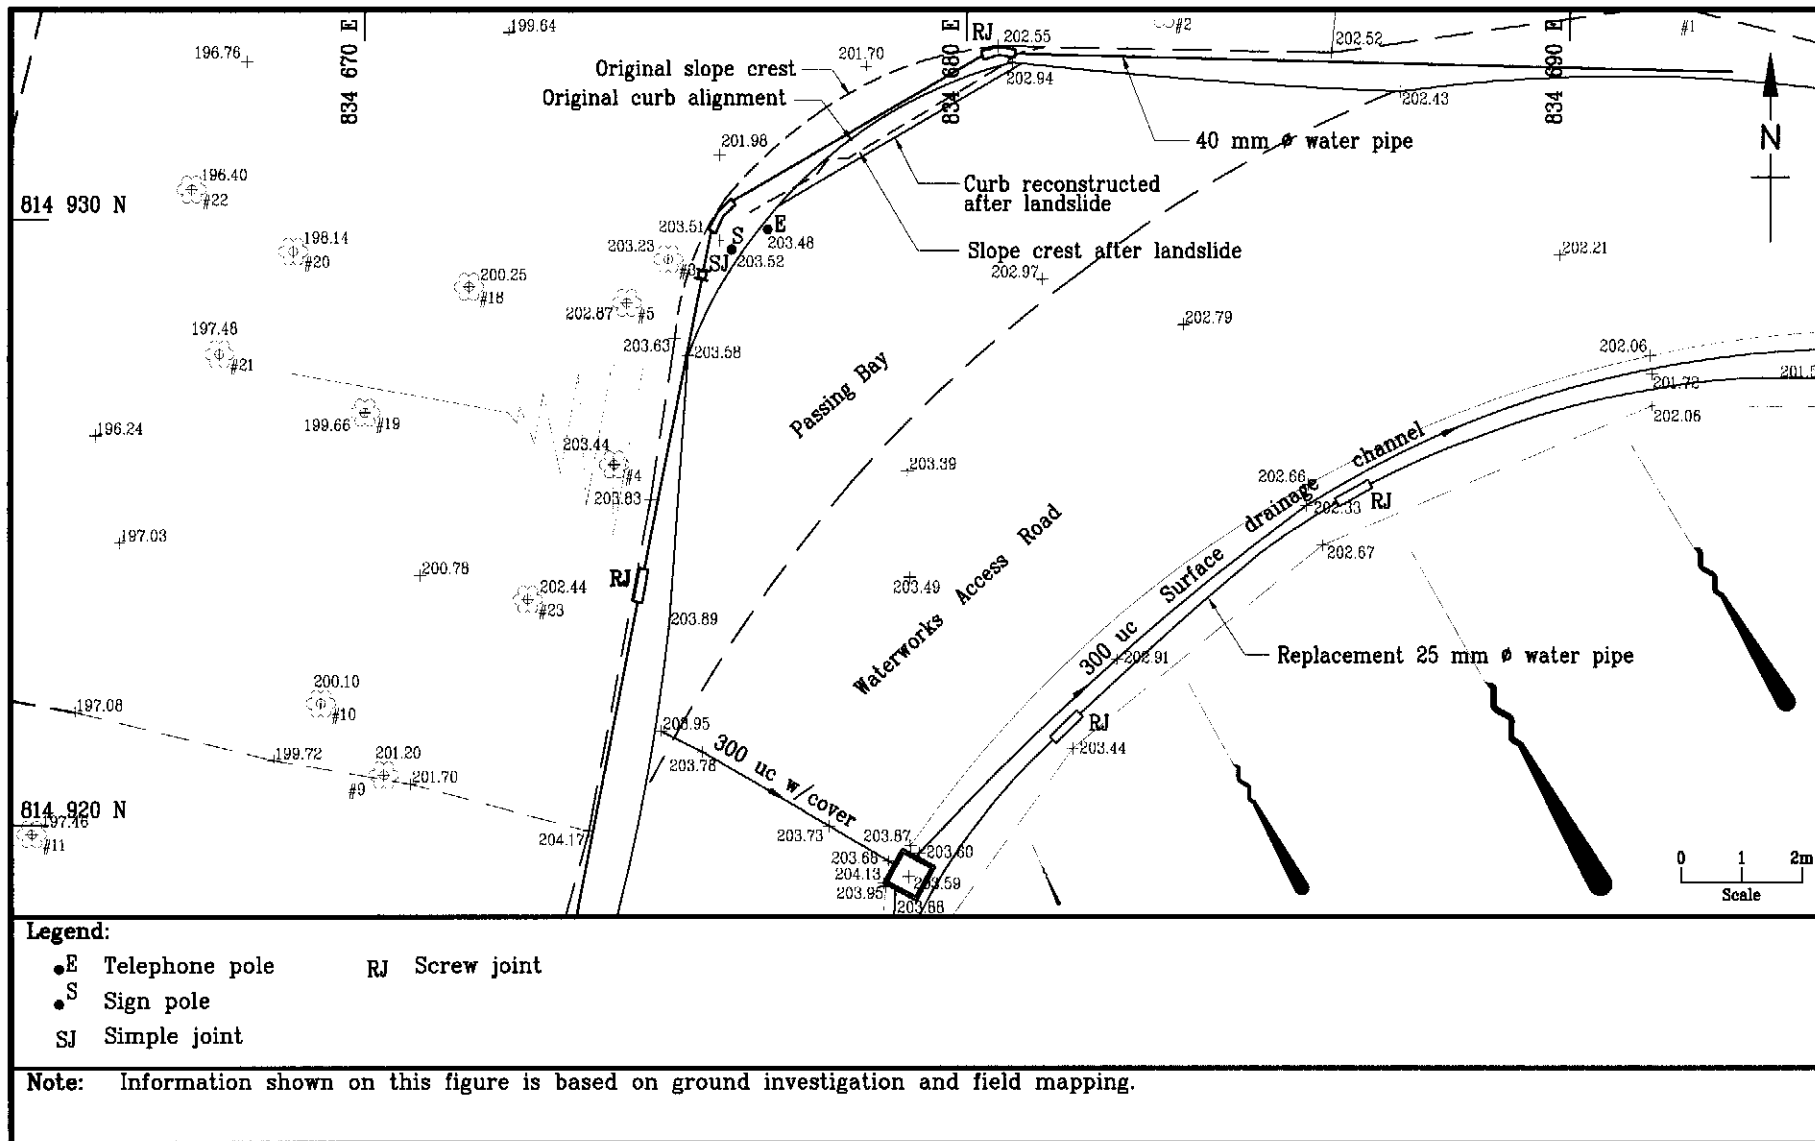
Layout of Drainage and Water-carrying Services at Waterworks Access Road
